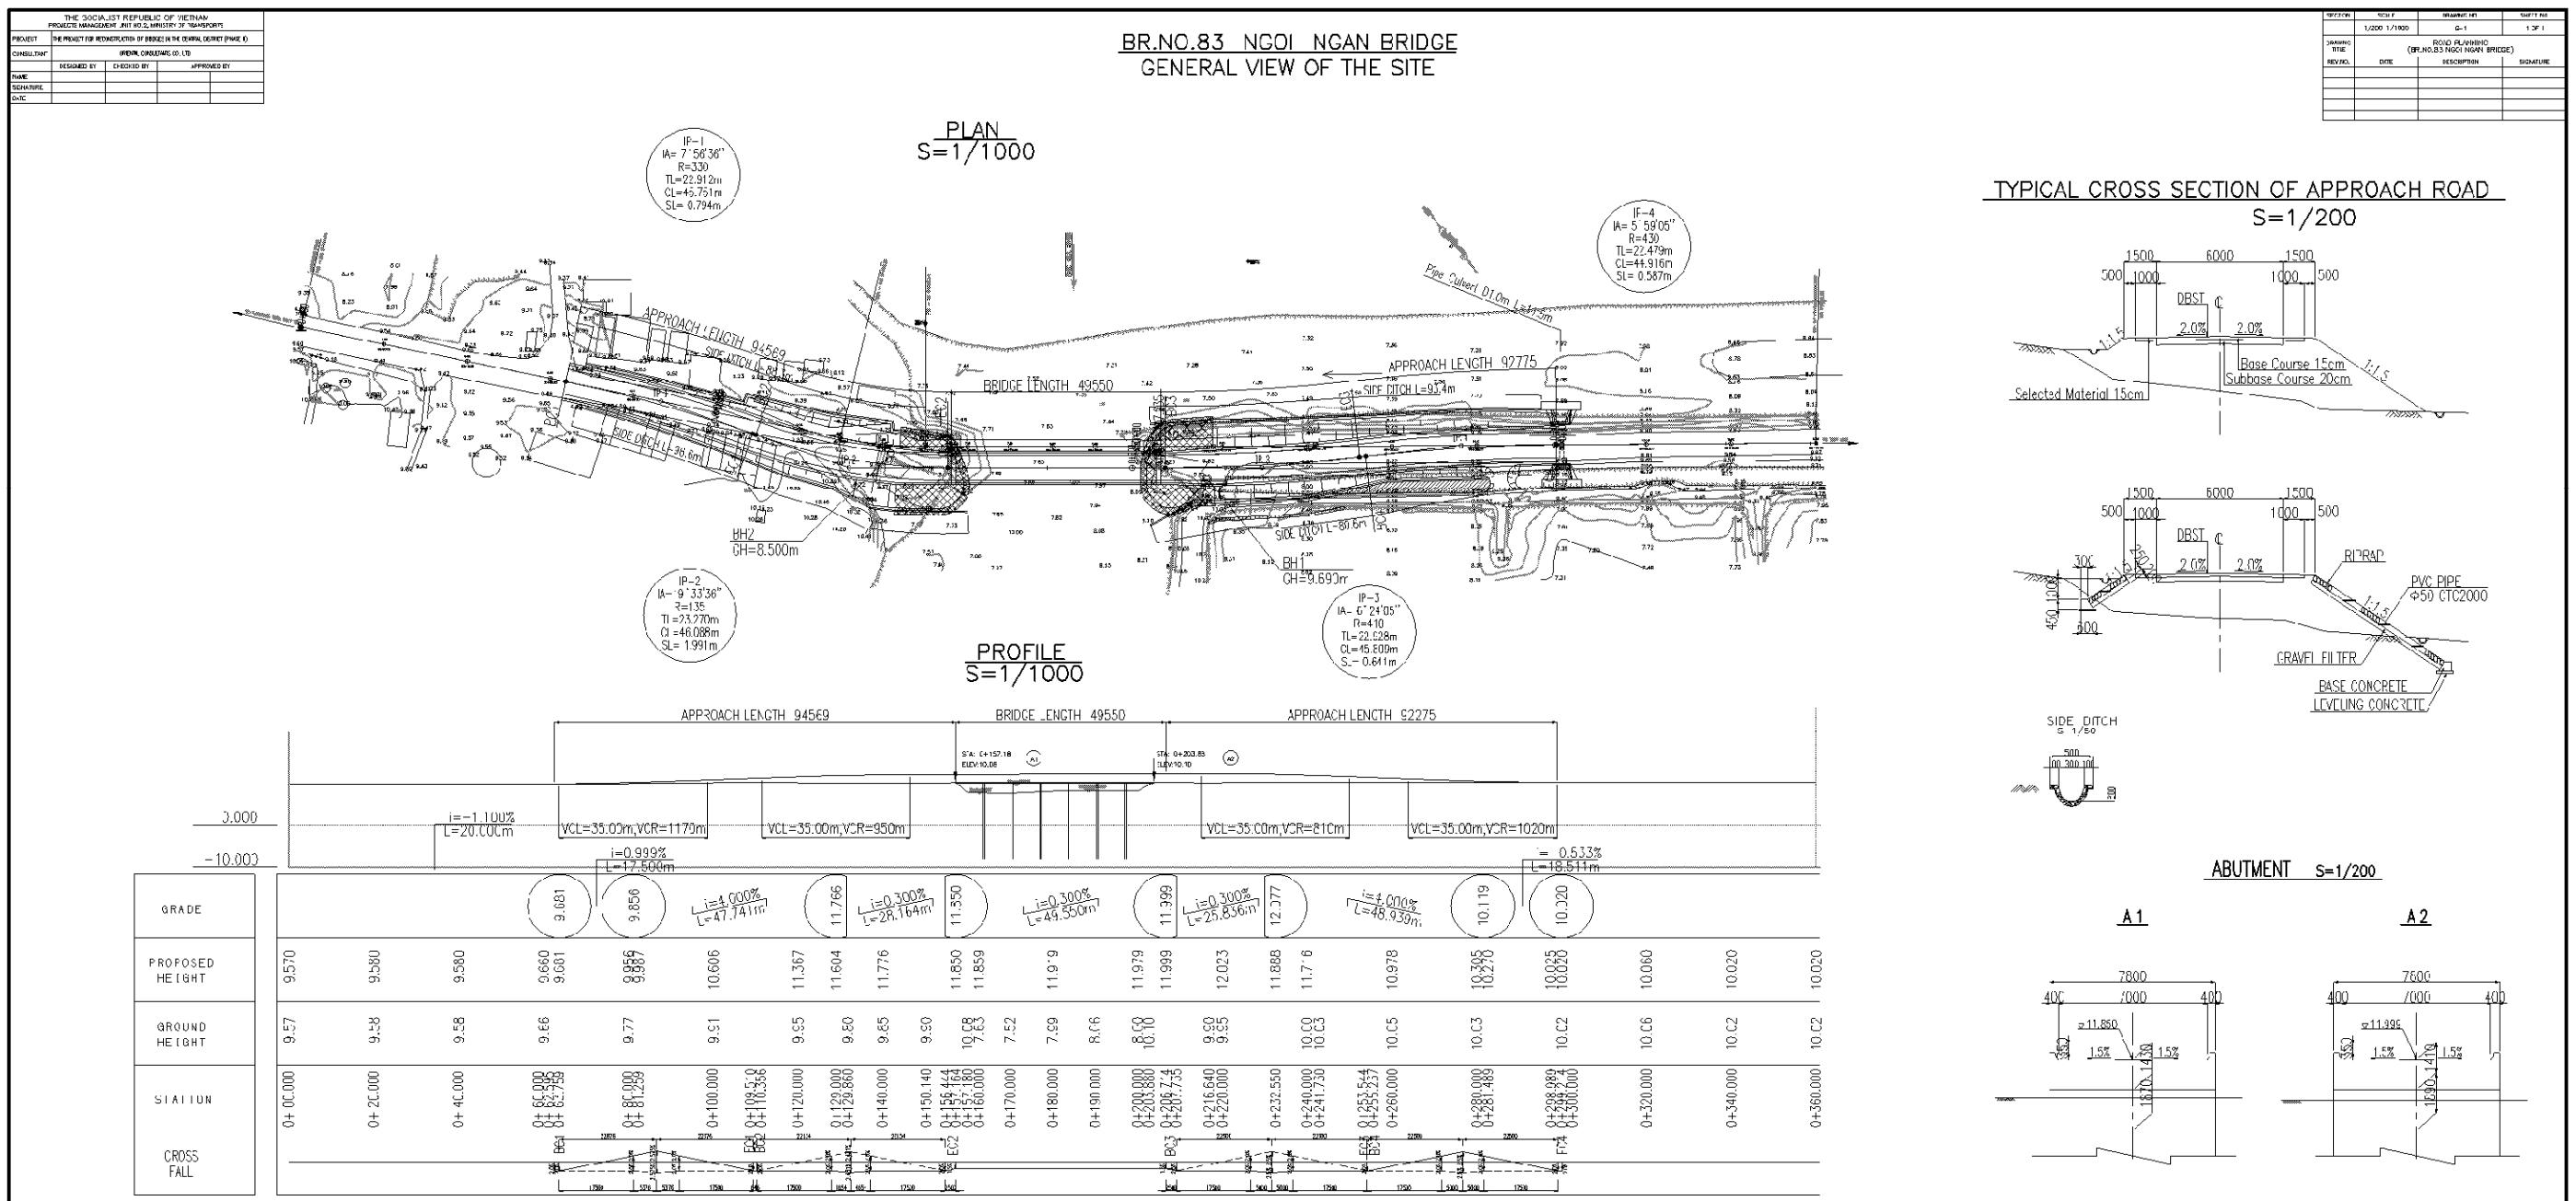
Ngoi Ngan Bridge (General View throughout Site)
